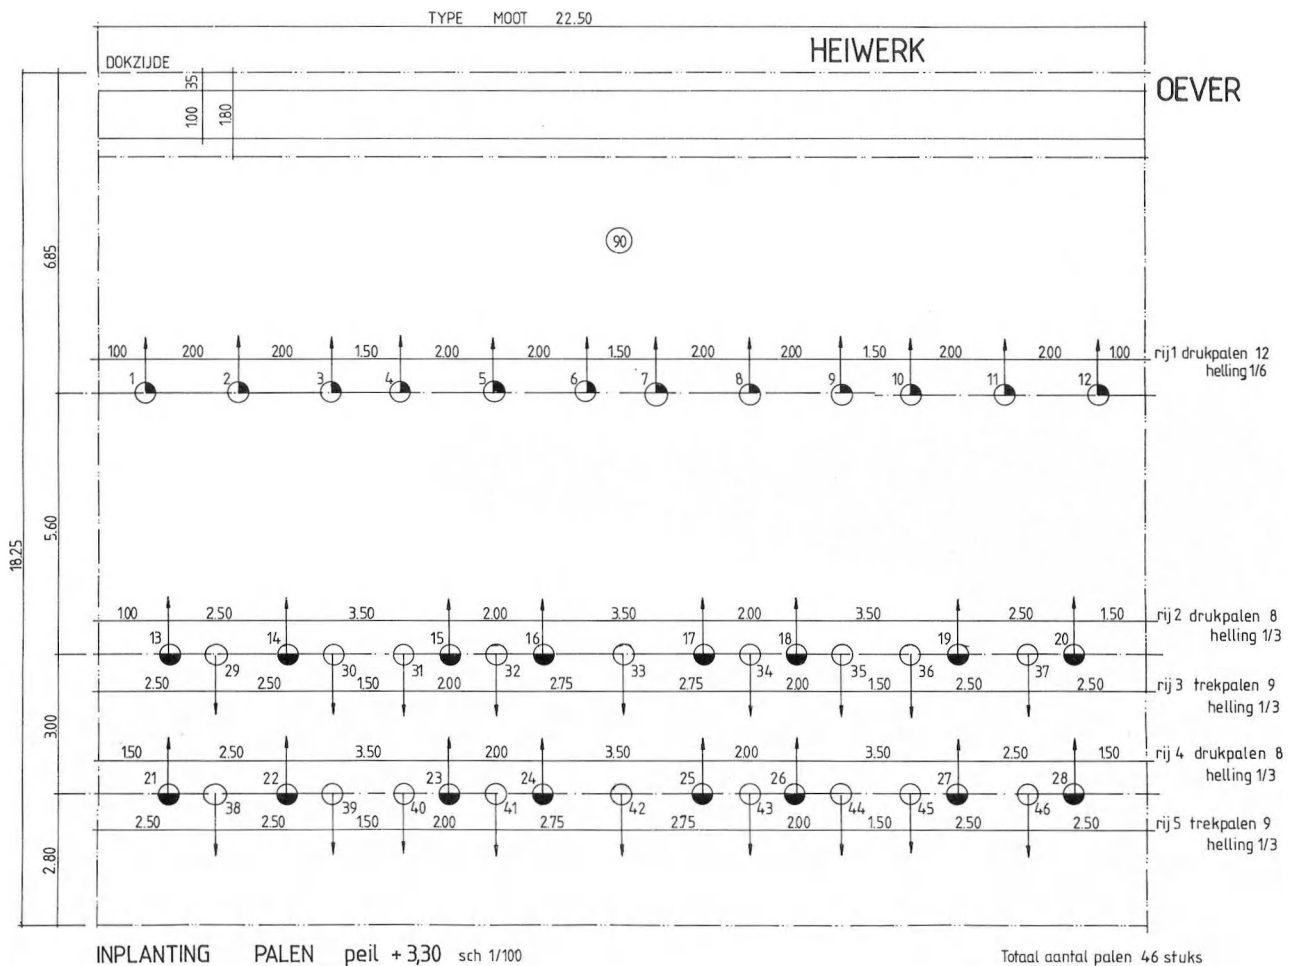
Pile configuration of a standard section of the slurry wall.
